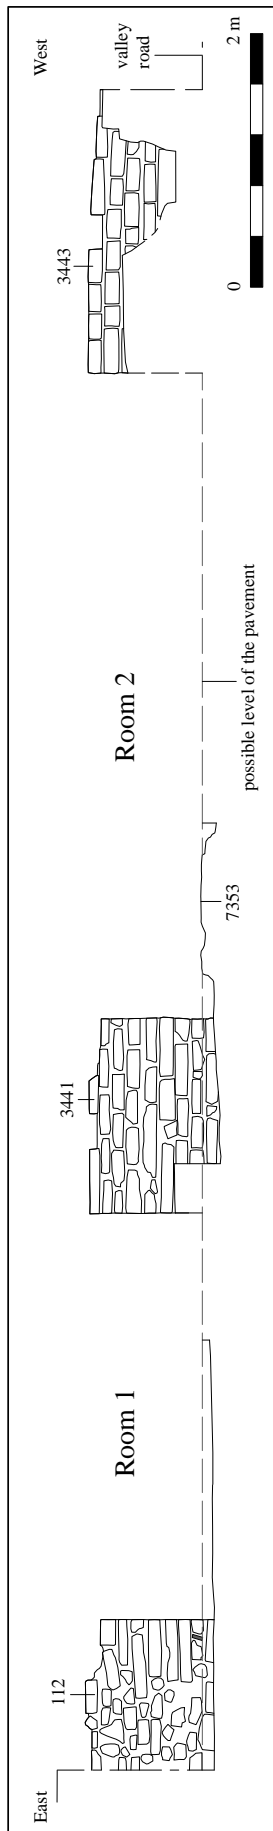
Elevation of the northern wall of Building 4 showing the entrances into Rooms 1 and 2
